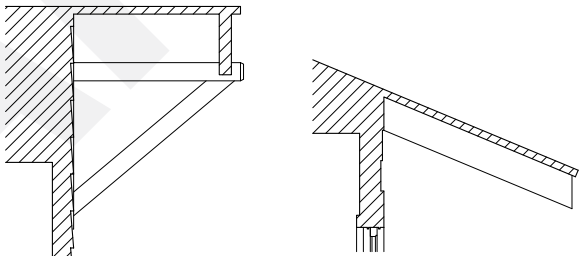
Typical exposed eave with knee bracket (left) and exposed rafter tail (right)
